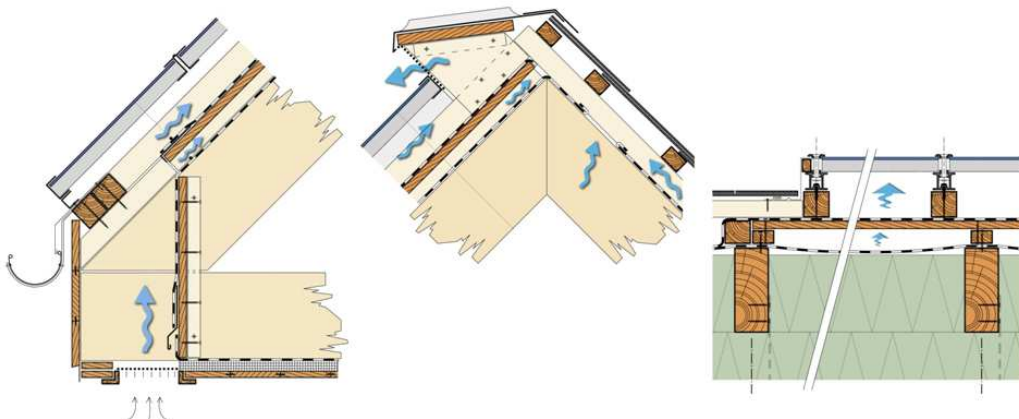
Sections of the roof structure: detail at the eaves with the air inlet (left), detail at the ridge with the air outlet (centre) and horizontal section at the transition between the PV array and traditional roof tiling (right).
